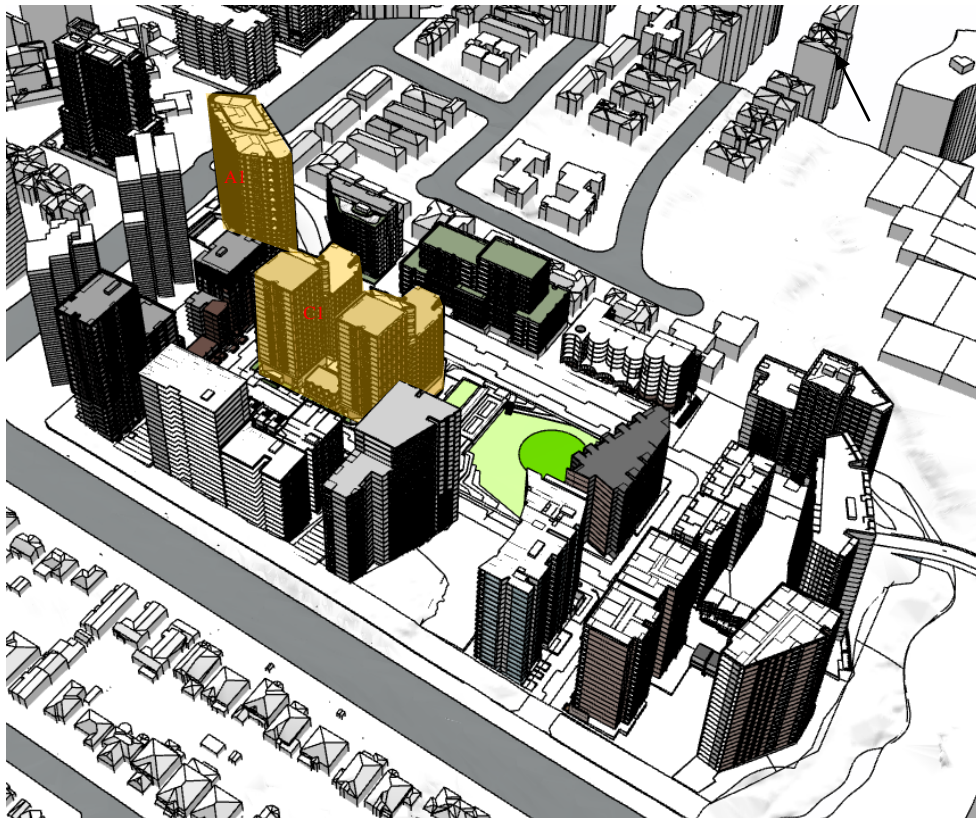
Massing diagram of the precinct with Stage 1 buildings highlighted.
